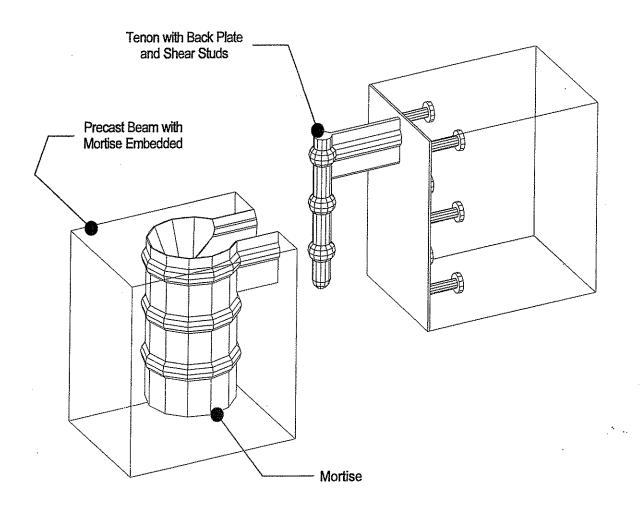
Proposed ATLSS Beam-to-Beam Connection
